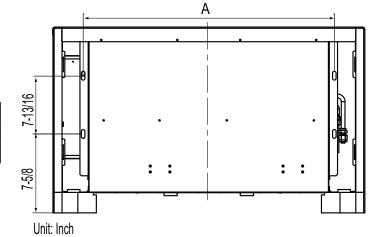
Bolt Pitch for Floor Standing Indoor Units.
